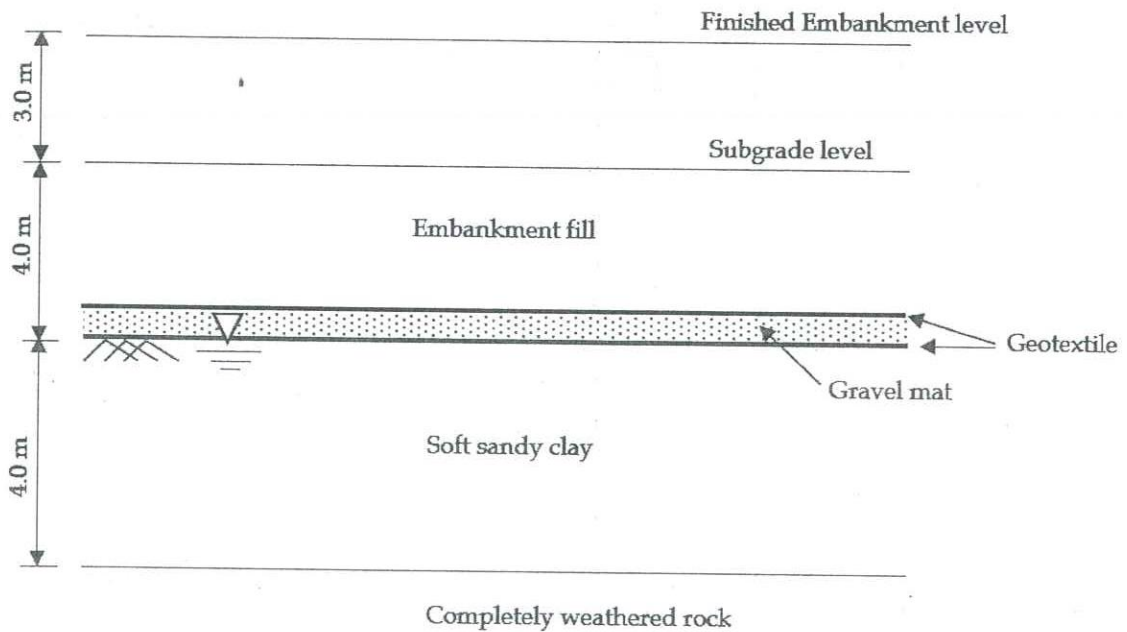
Cross section of the embankment with sub surface soil profile
